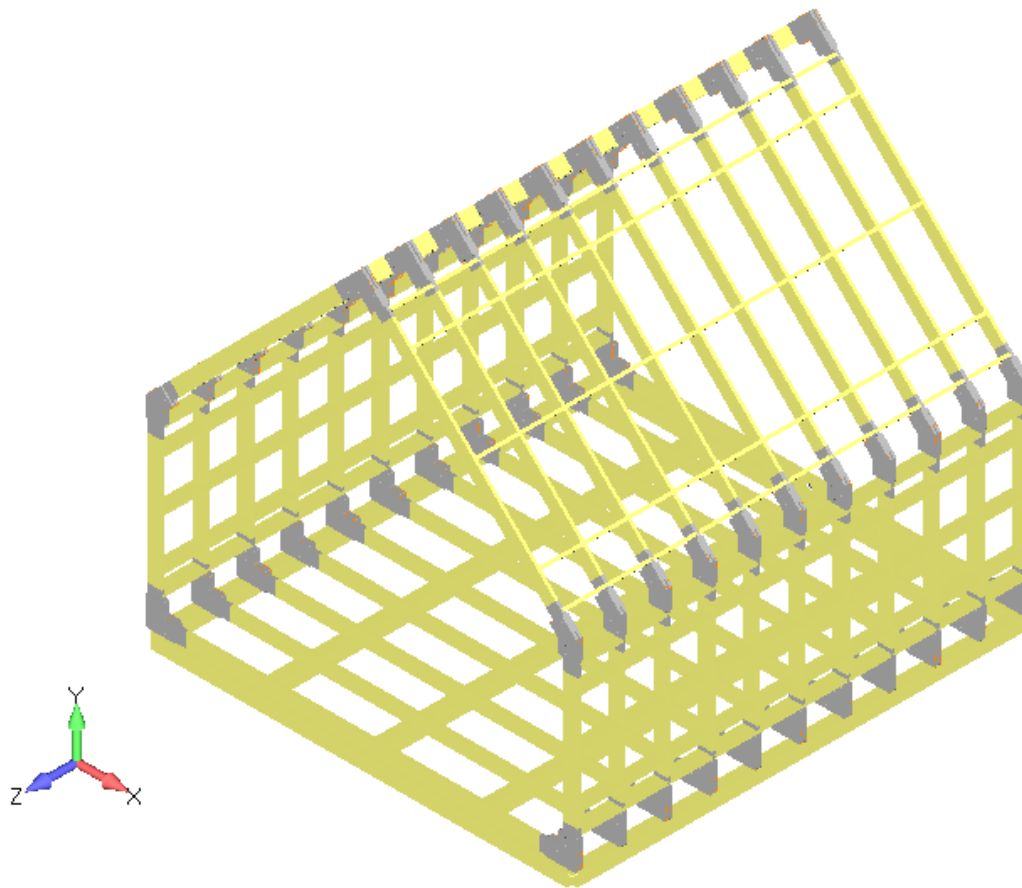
General view of the frame of the FINHA gable roof building, frame width 6 m, slope is 45 deg.
